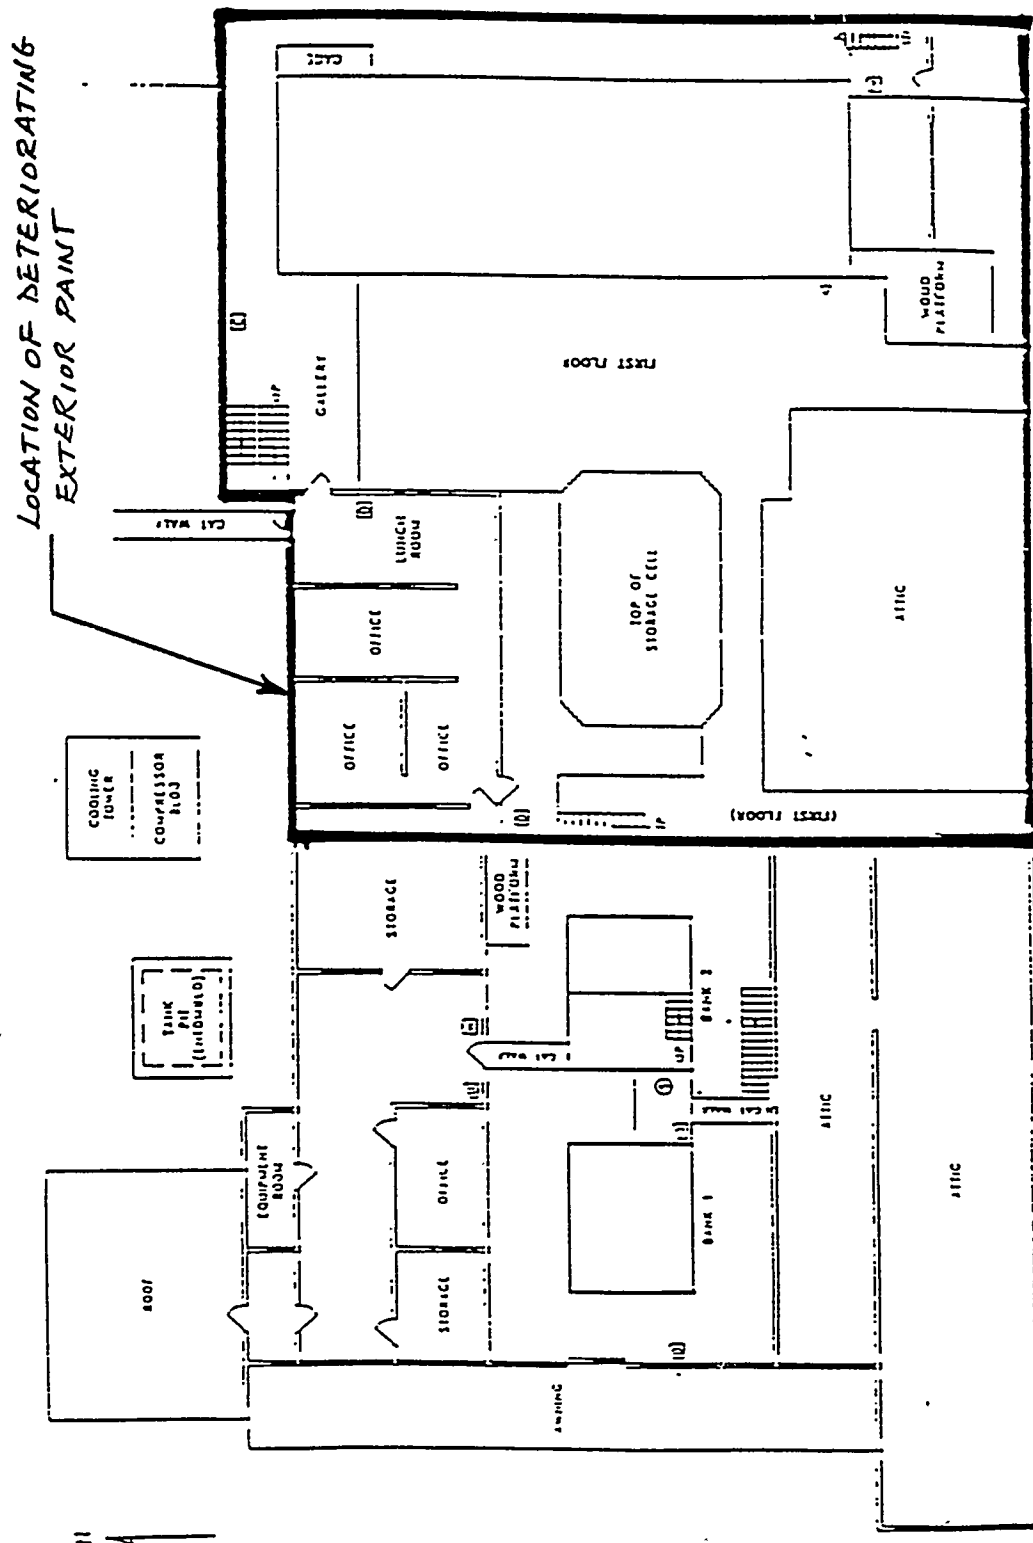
Diagram of second floor of Building 3026-D (perimeter is in bold).
